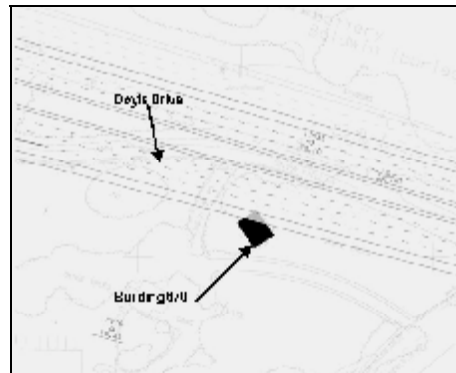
Use of Building 670 with Preferred Alternative
